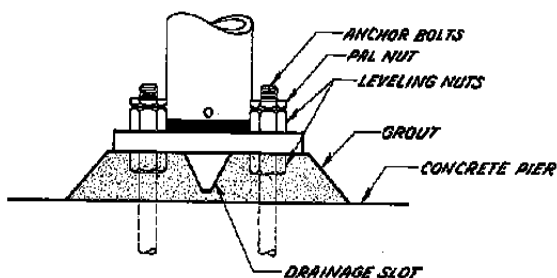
81 13-2: Grouting and drainage in tower anchorage area
